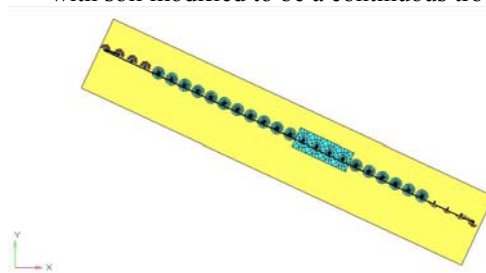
NCAC strong-post W-Beam guardrail with modified soil, overhead view
